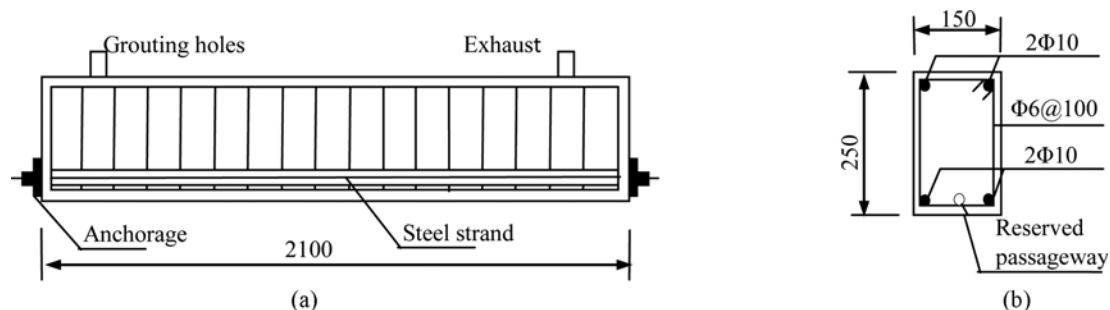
Dimensions and Reinforcement Diagram of the Test Beams (mm): (a) Side View of Test Beam, (b) Normal Section of Test Beam
